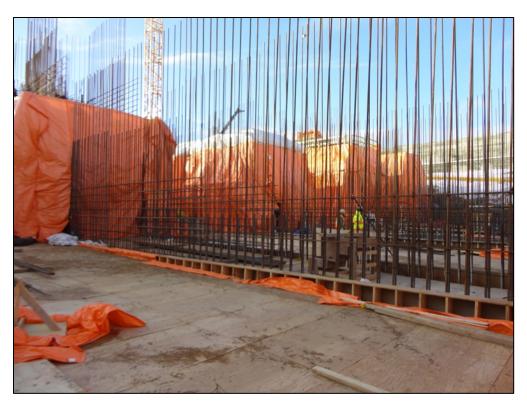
Spillway, rebar installation for Pier 3. (November 26, 2014)
